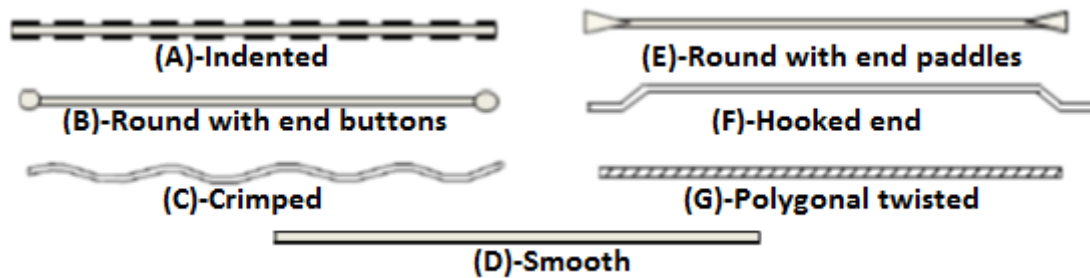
Typical profile of steel fibres commonly used in concrete. (Naaman, 2003)
